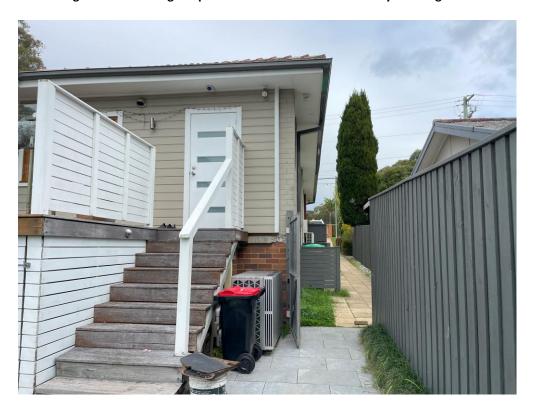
View of the rear elevation of the dwelling, looking south-west along the pedestrian access to the secondary dwelling at the rear of the site
